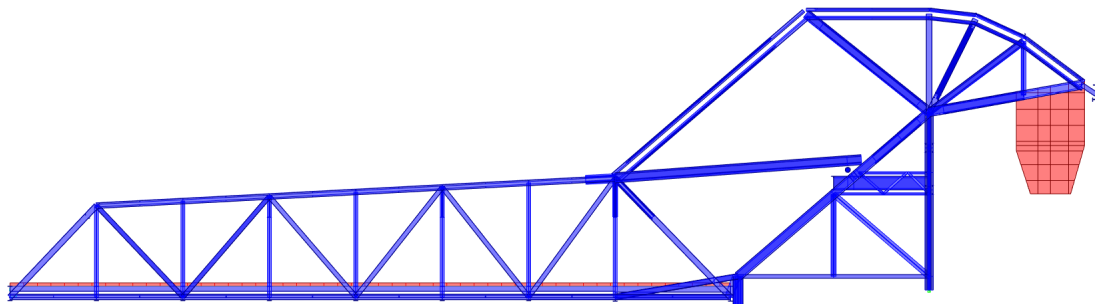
Screenshot of LaSalle Causeway Bascule Bridge Finite Element Model- Closed Position - North View
